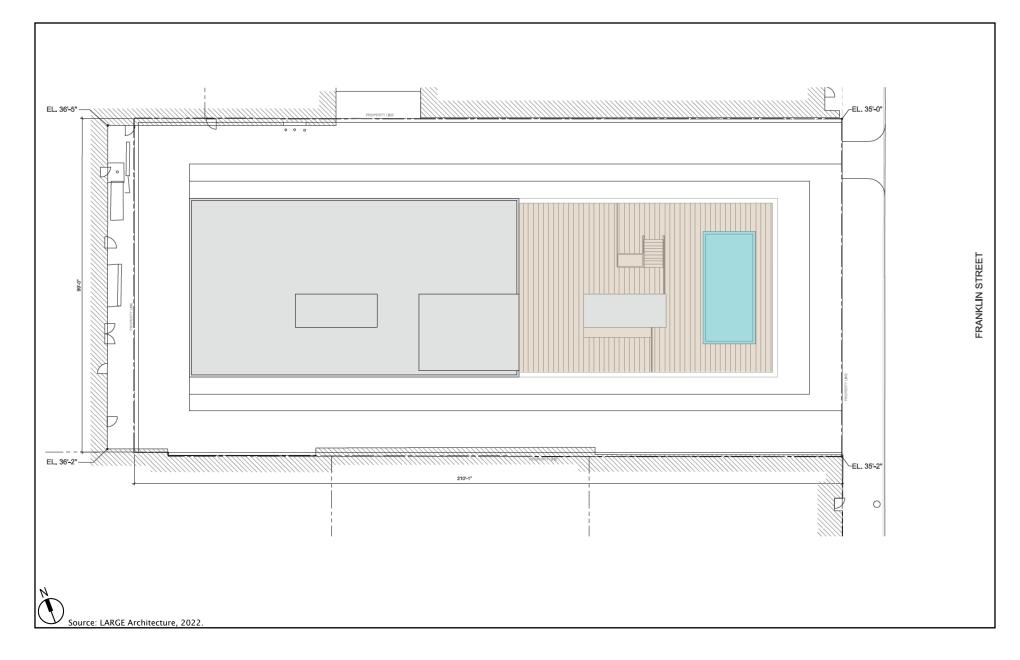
Site Plan – 1431 Franklin Street Residential Project
